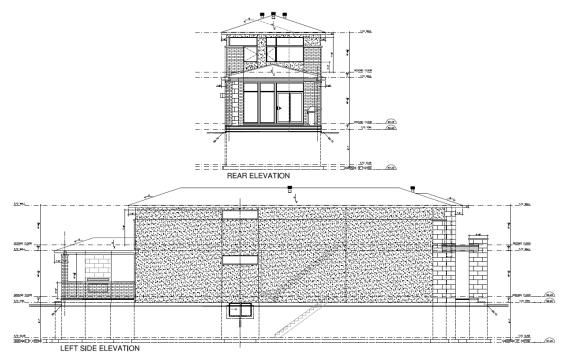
Proposed Rear and Left-Side Elevations of 1094 Normandy Crescent (Building 1)
